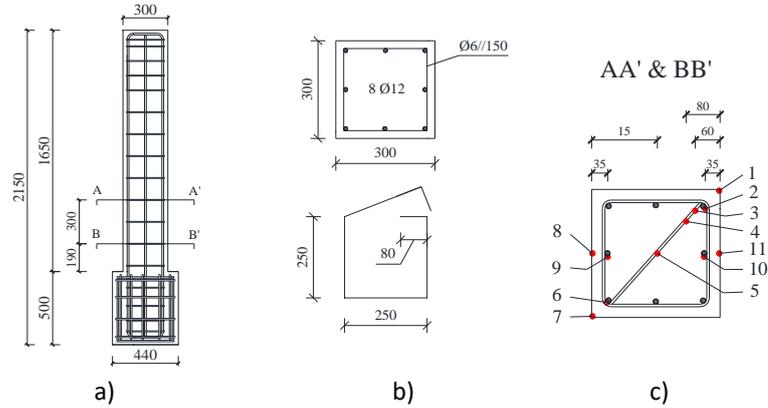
Geometry and reinforcement detailing: a) global dimensions; b) cross-section; c) location of thermocouples (dimensions in mm).
